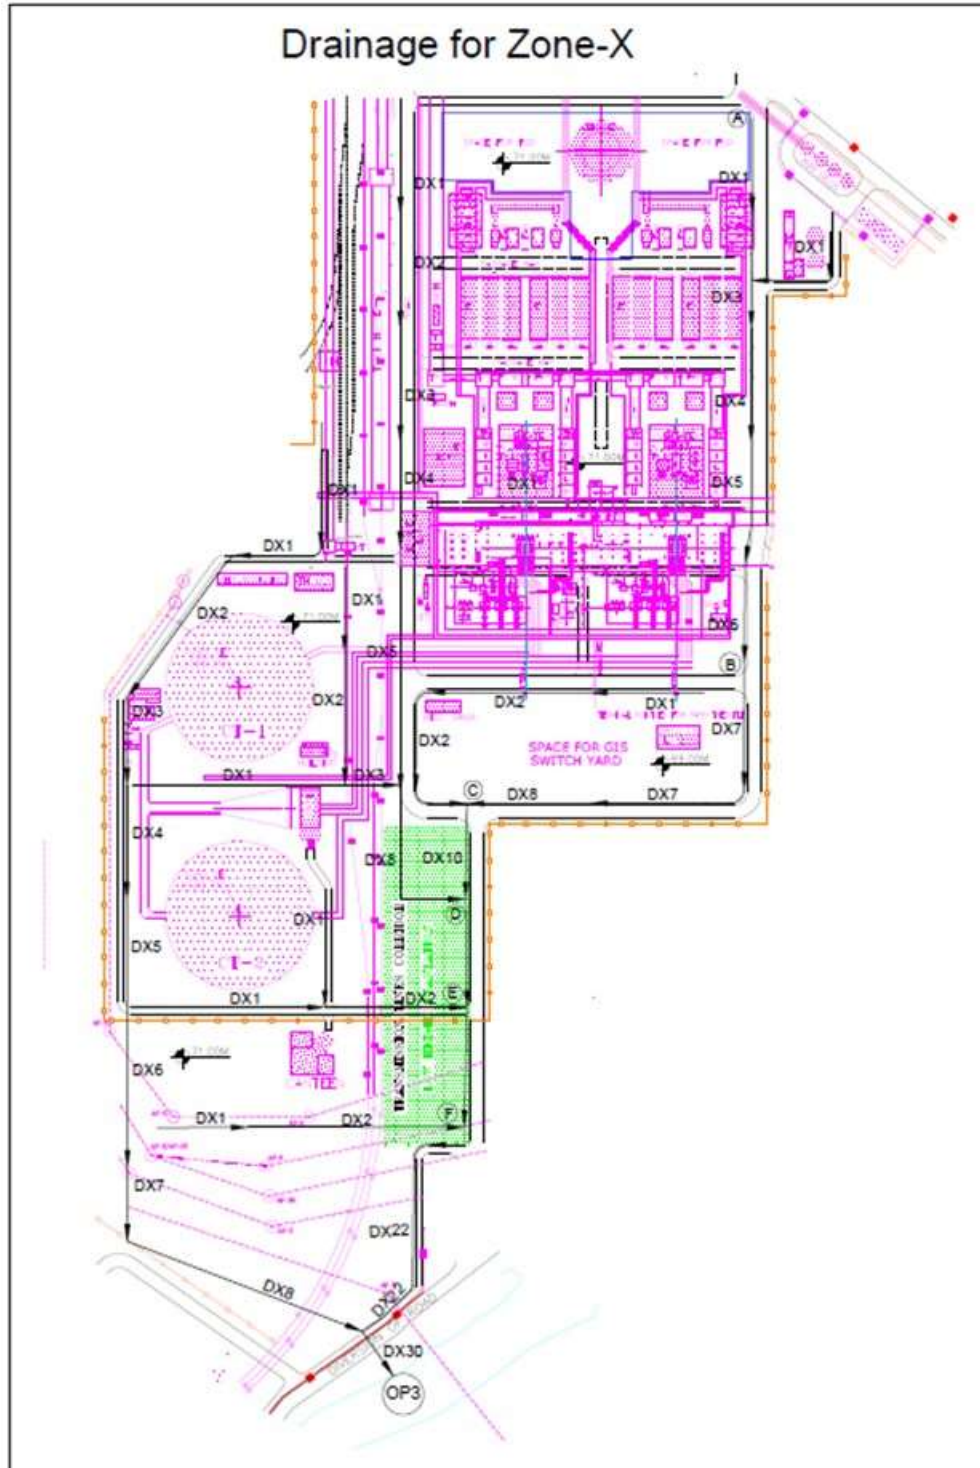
X Zone drainage plan showing drains, longest flow path and outfall location
